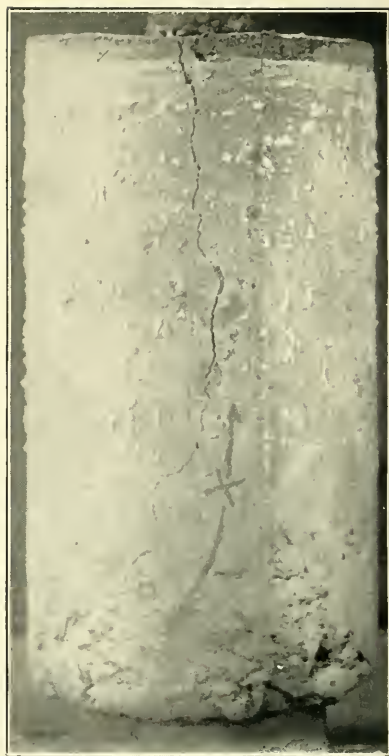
SHOWING RADIAL CRACK, DEPOSIT REMOVED. FIRST SERIES.
